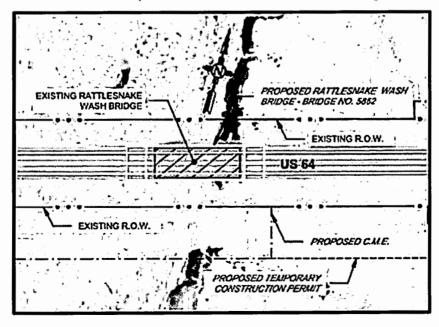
Proposed Plan View of Rattlesnake Wash Bridge
